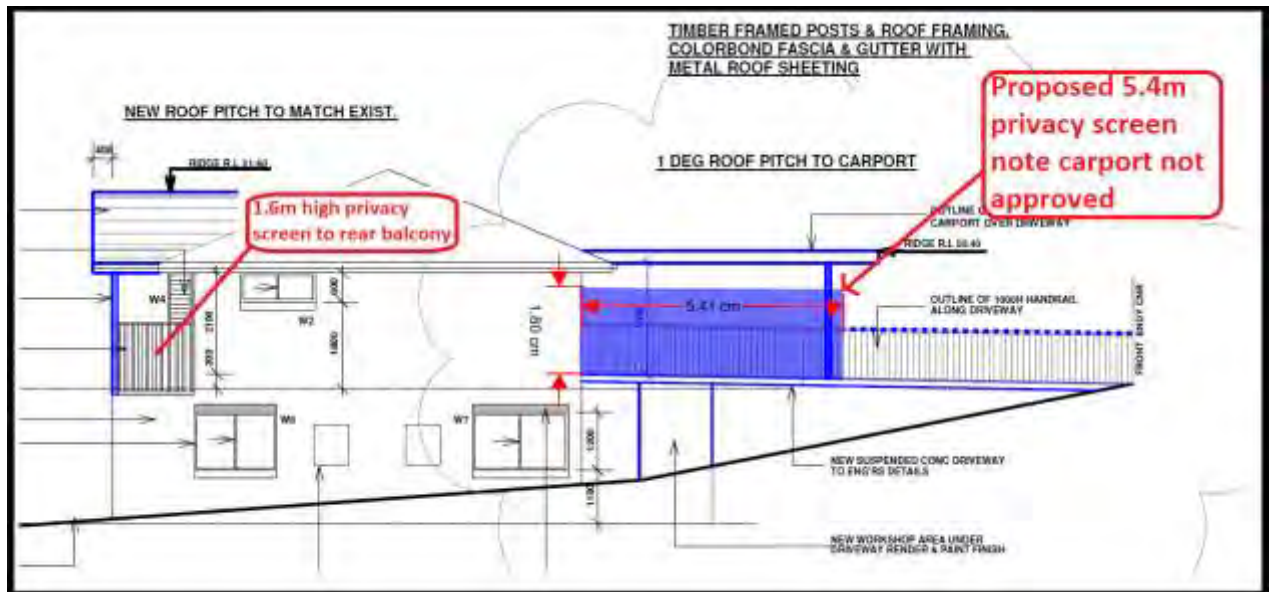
Proposed 1.8m privacy screen provided for 5.4m (standard car space length) from the building façade. Note the carport is not approved, but the balcony privacy screen is considered acceptable.
